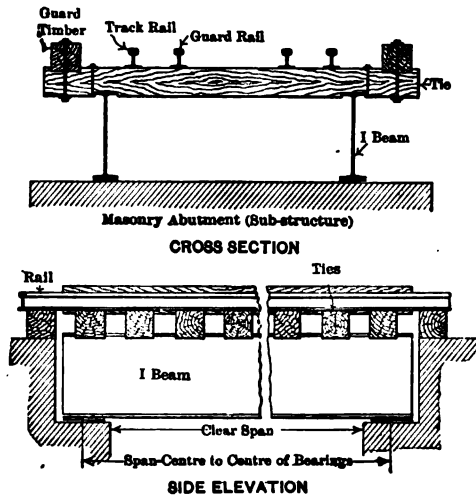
I-Beam Bridge for Single Track Railroad.
